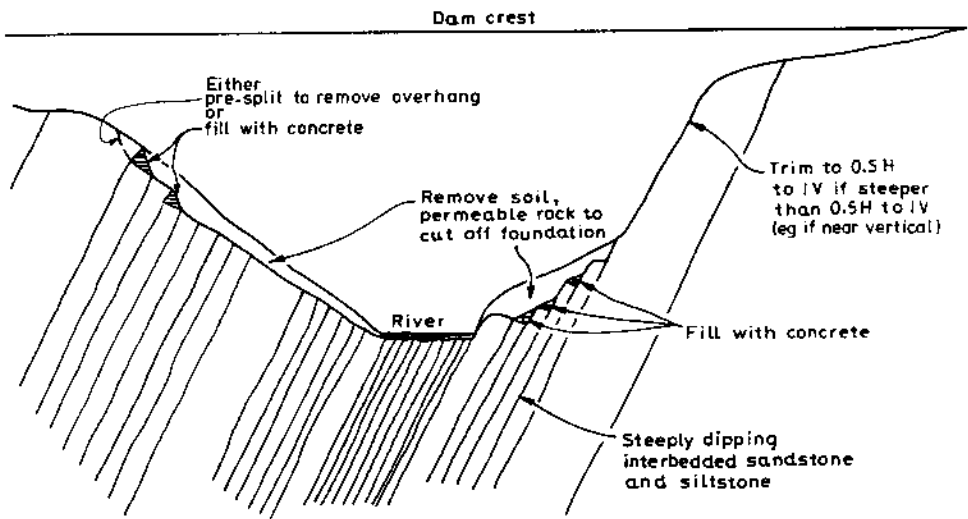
Slope modification in the cutoff foundation for interbedded sandstone and siltstone, steeply dipping bedding.
